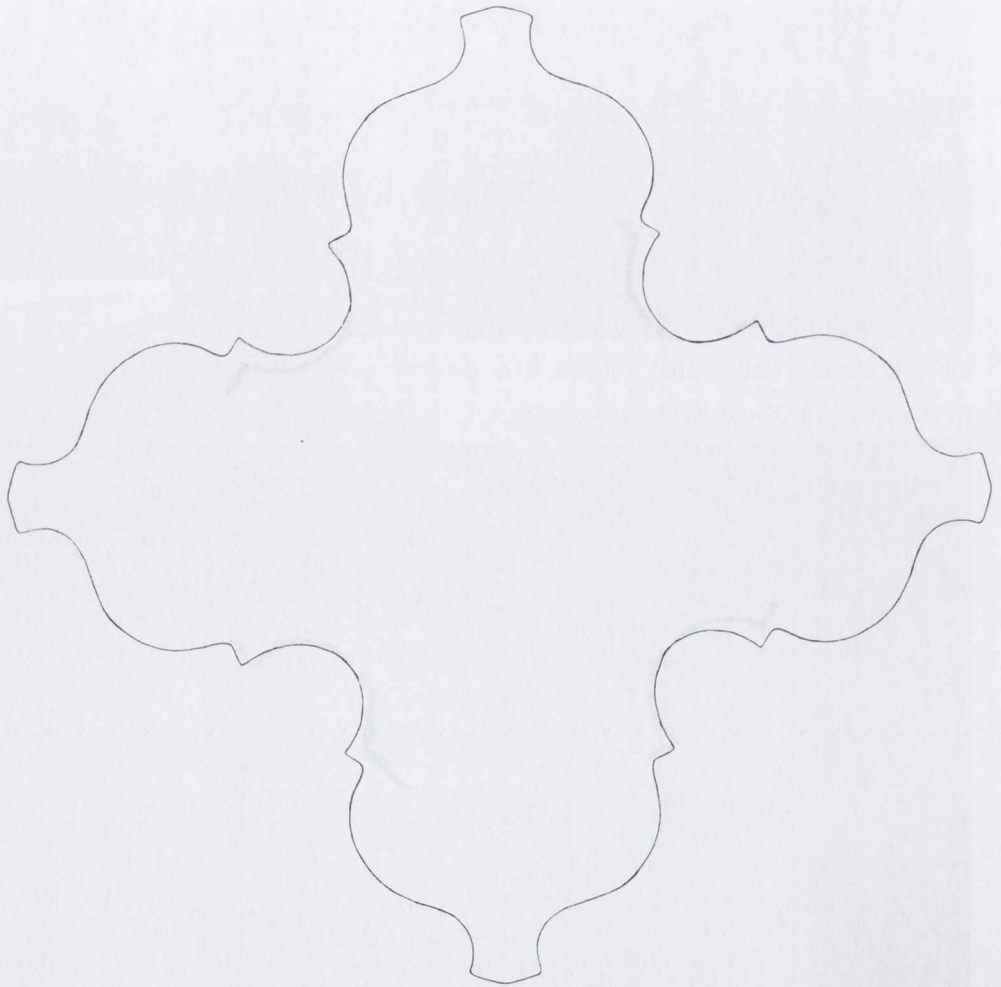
Castle Chapel, Dublin Castle, nave pier moulding, modelled 1811–12, drawn by Danielle O’Donovan.
